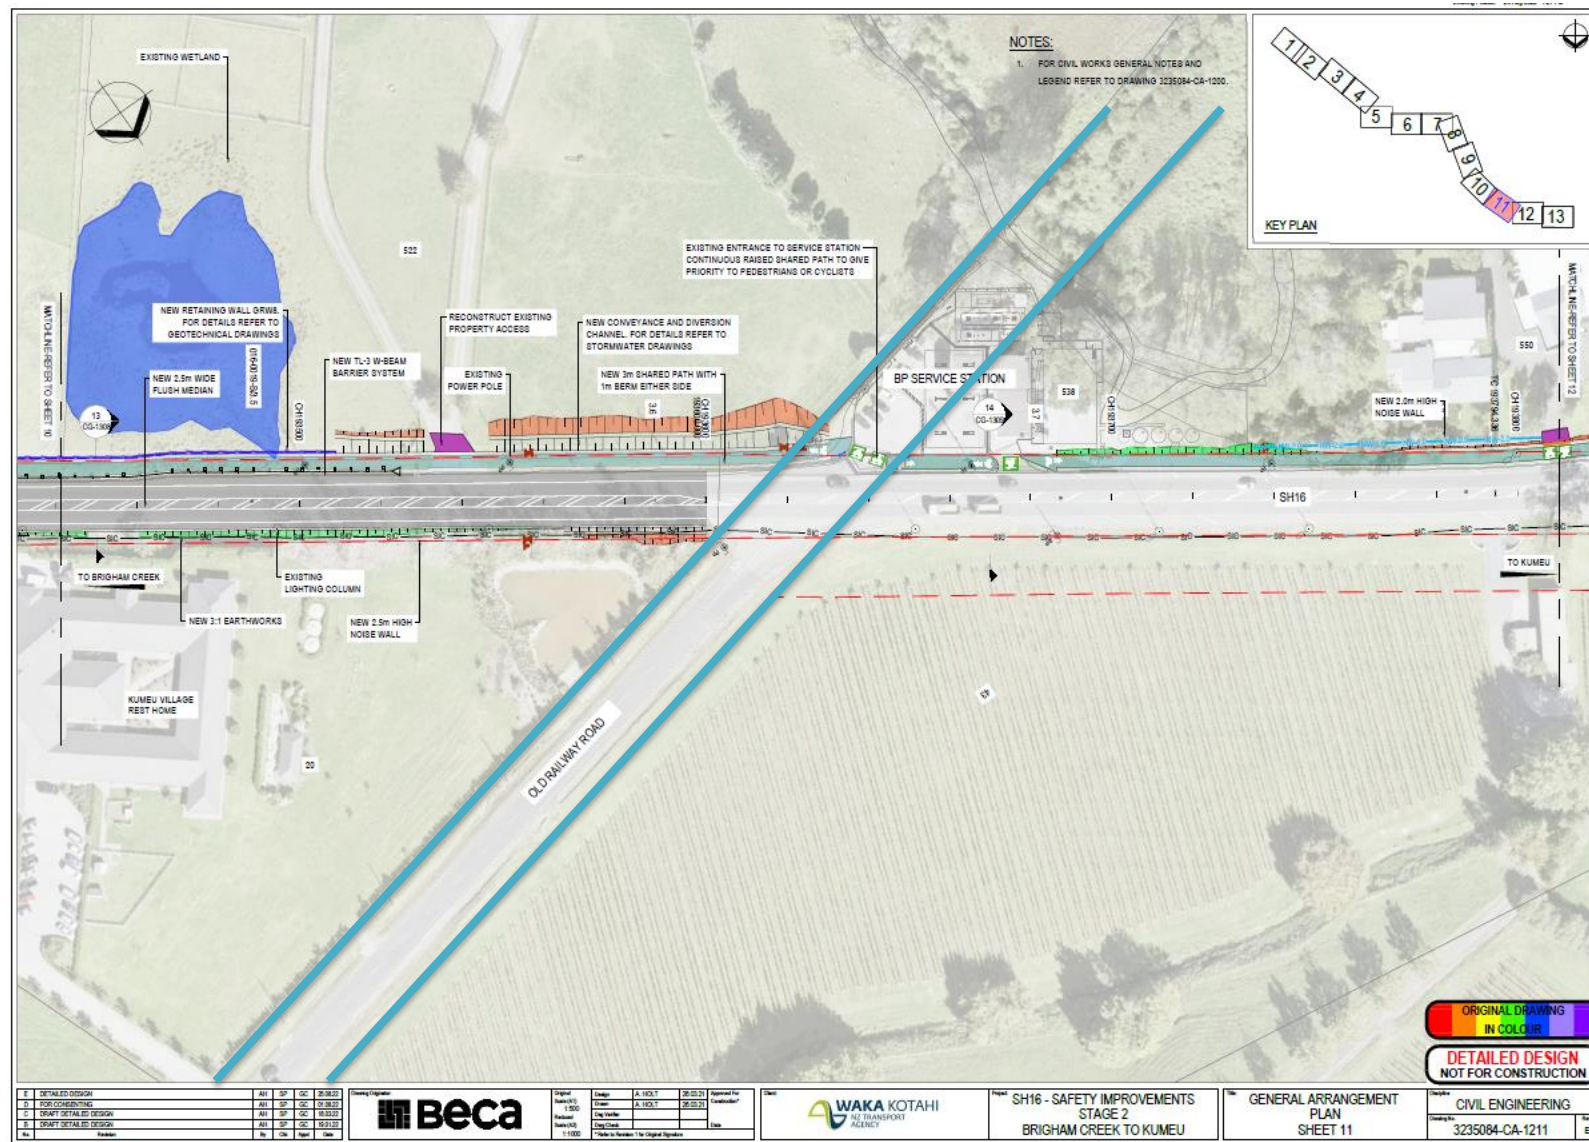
Proposed works in the vicinity of the Old Railway Road intersection, Section D. Cyan lines indicate the alignment of the rail line R10/1487 (32351084-CA-1201 to 1213, sheet 11)
